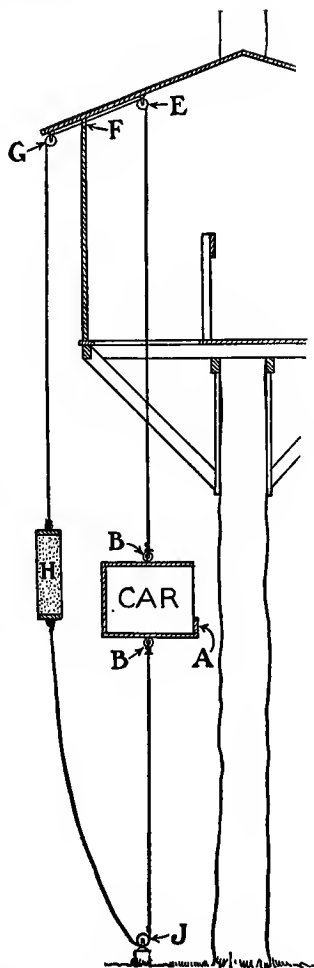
Section through Tree-Hut showing Dumb-Waiter Car, Cables, Pulleys and Counterbalance.
